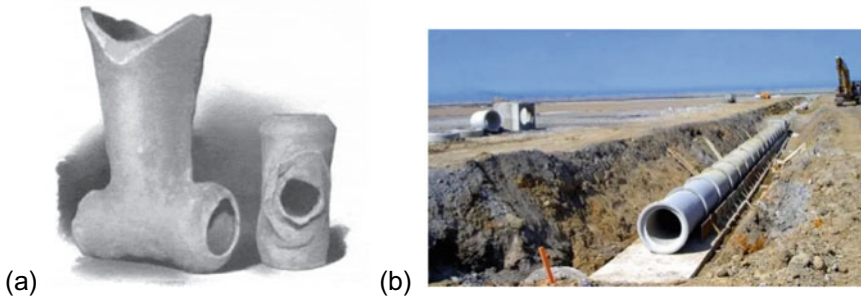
a Knee and T joints made about 4000 B.C., found in the excavation of the Temple of Bl at Nippur, Babylonia. *Source* Cast Iron Pipe, by United States Cast Iron Pipe and Foundry Company, 1914. b Reinforced concrete sewer pipes under construction (<https://theconstructor.org/concrete/design-concrete-pipes-sewers/17652/>)
